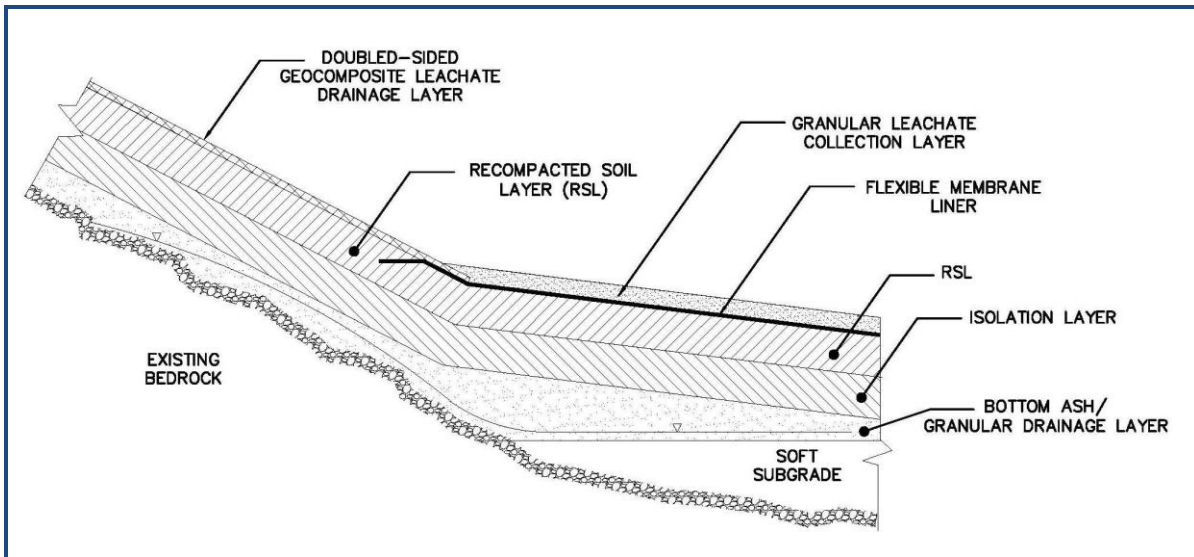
Drainage and Liner System Detail for Steep Side Slopes
